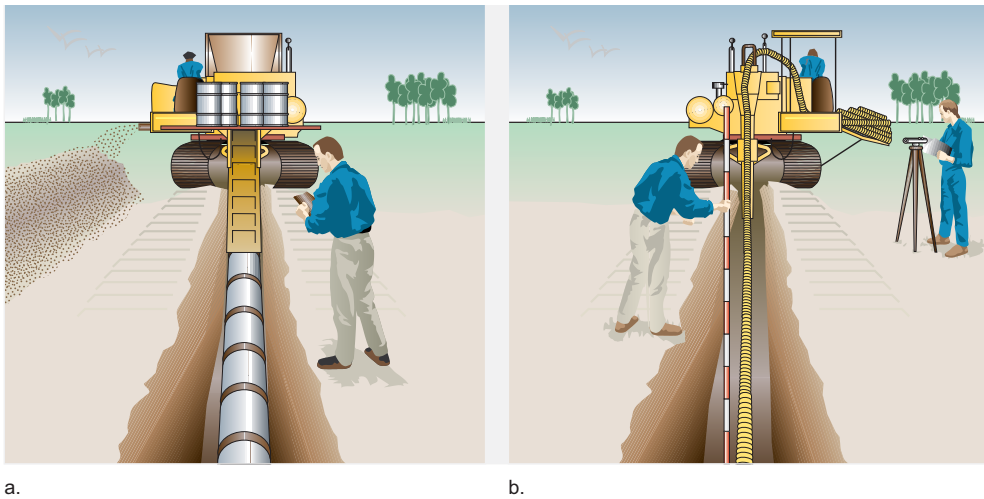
Traditionally used quality control: visual inspection (a) and checking the drain level (b)
